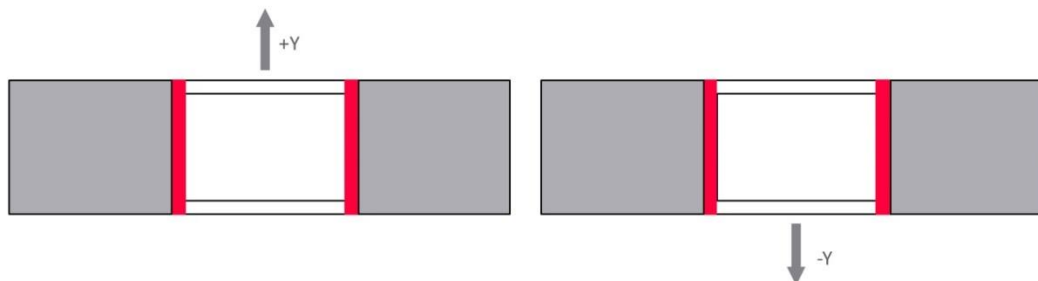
In the case above, only the direction +Y and -Y should be evaluated because walls perpendicular to loading direction +X and -X are not likely to fail out-of-plane because of the presence of an adjacent building (plan view)
